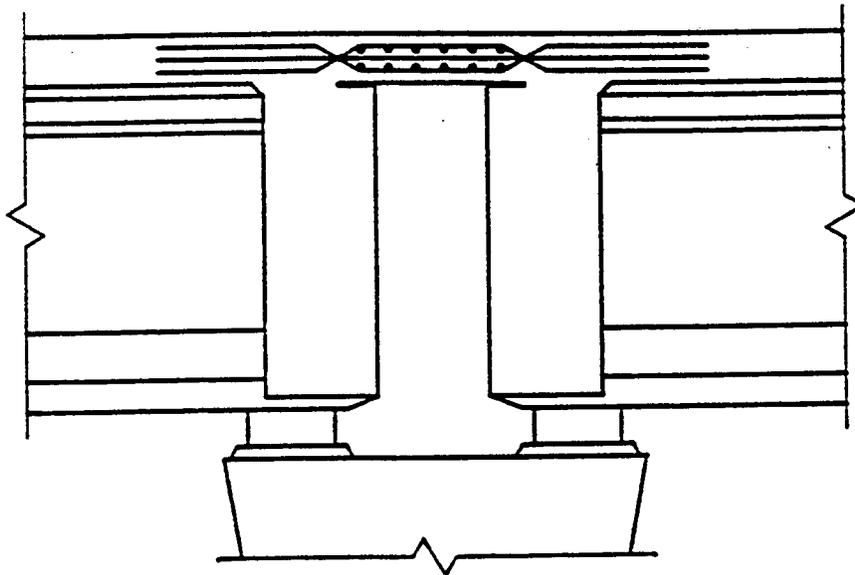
Precast Concrete I-Girder Longitudinal and Vertical Restrainer Details
